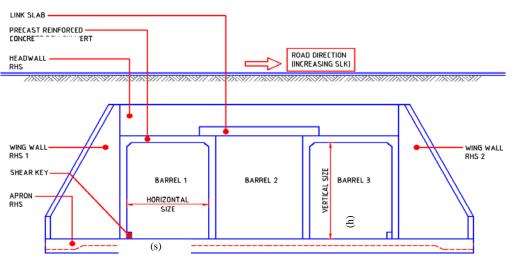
A - TYPICAL PRECAST BOX AND LINK SLAB, ELEVATION
